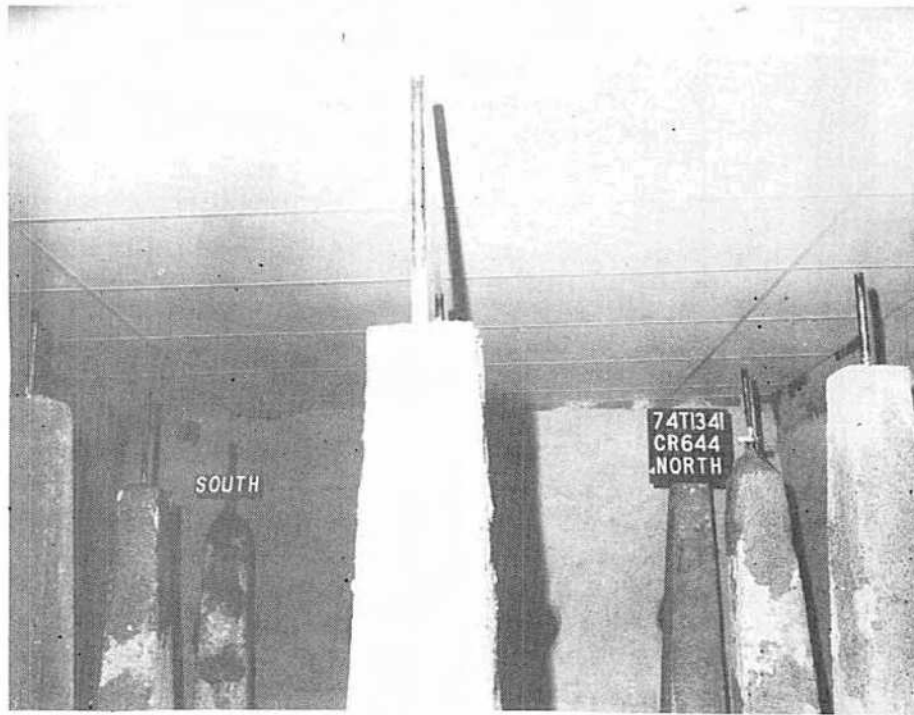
EXPOSED SURFACE BEFORE FIRE TEST, ASSEMBLY NO. 1
